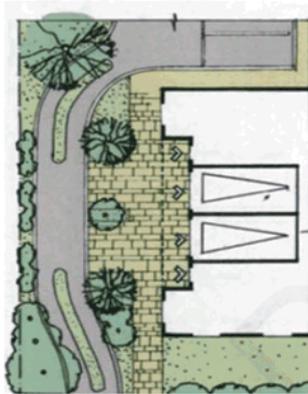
Curved pavement and landscape planting to reduce visual impact of driveway.
